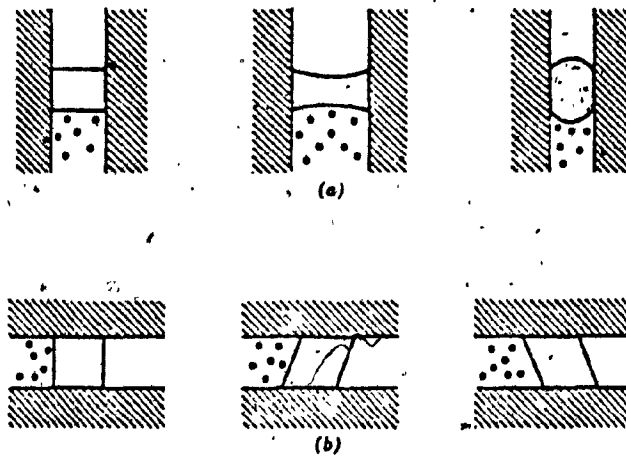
Deformation of sealant beads: a) butt joints, b) lap joints (4)
